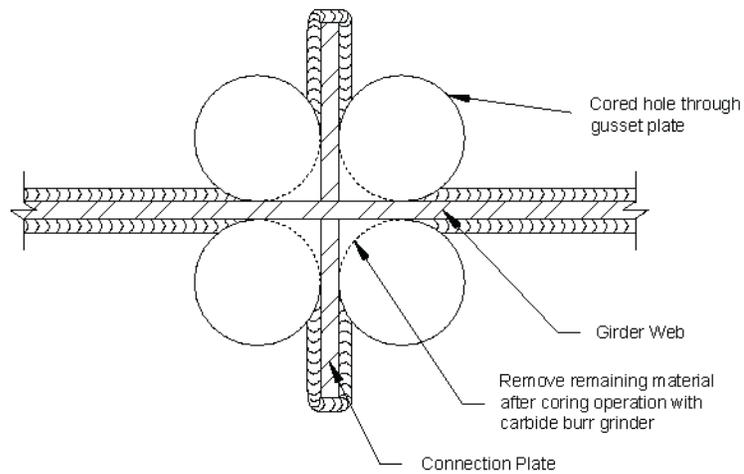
Retrofit detail for gusset plates with intersecting welds. (Crack Site #1)
